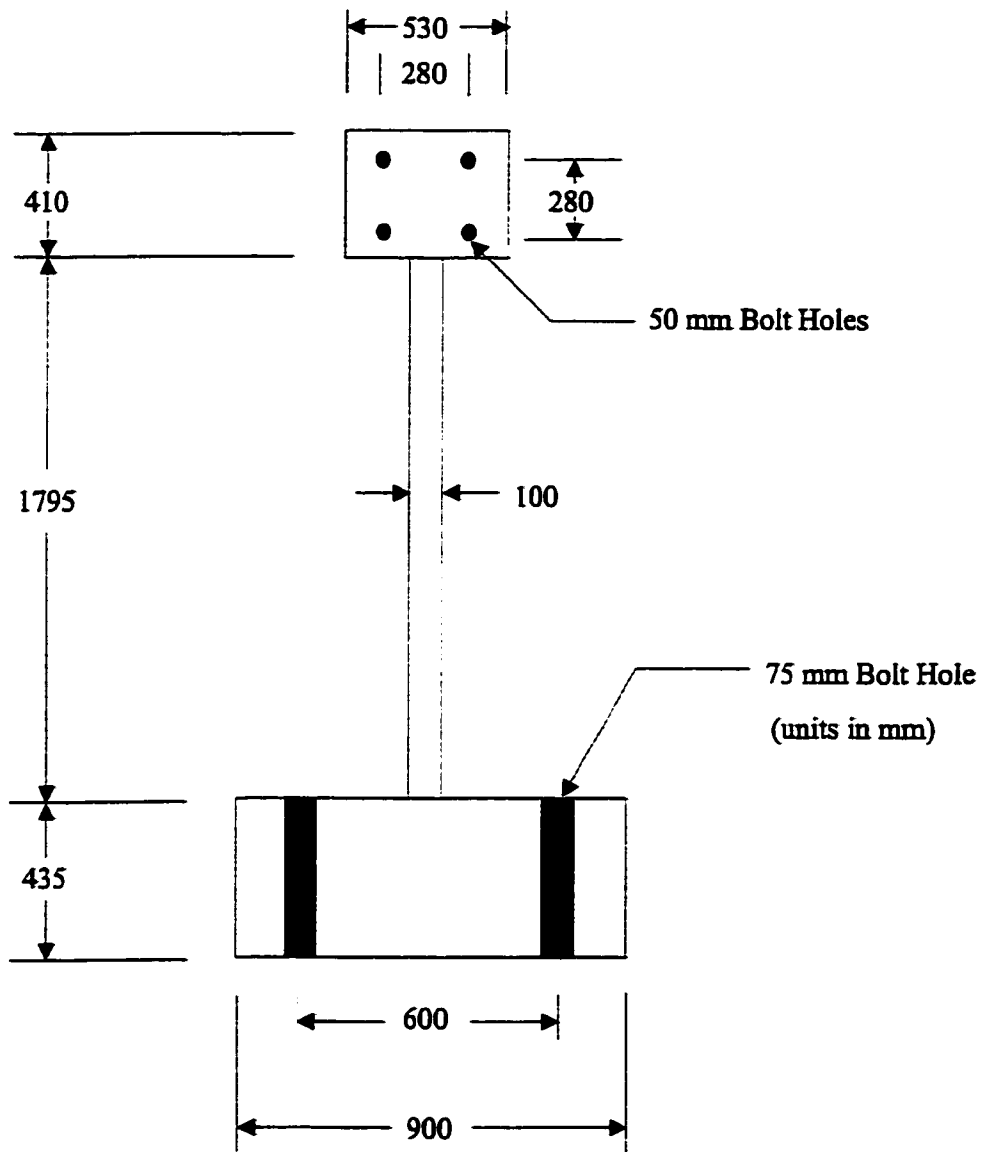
End view of a reinforced concrete shear wall test specimen
